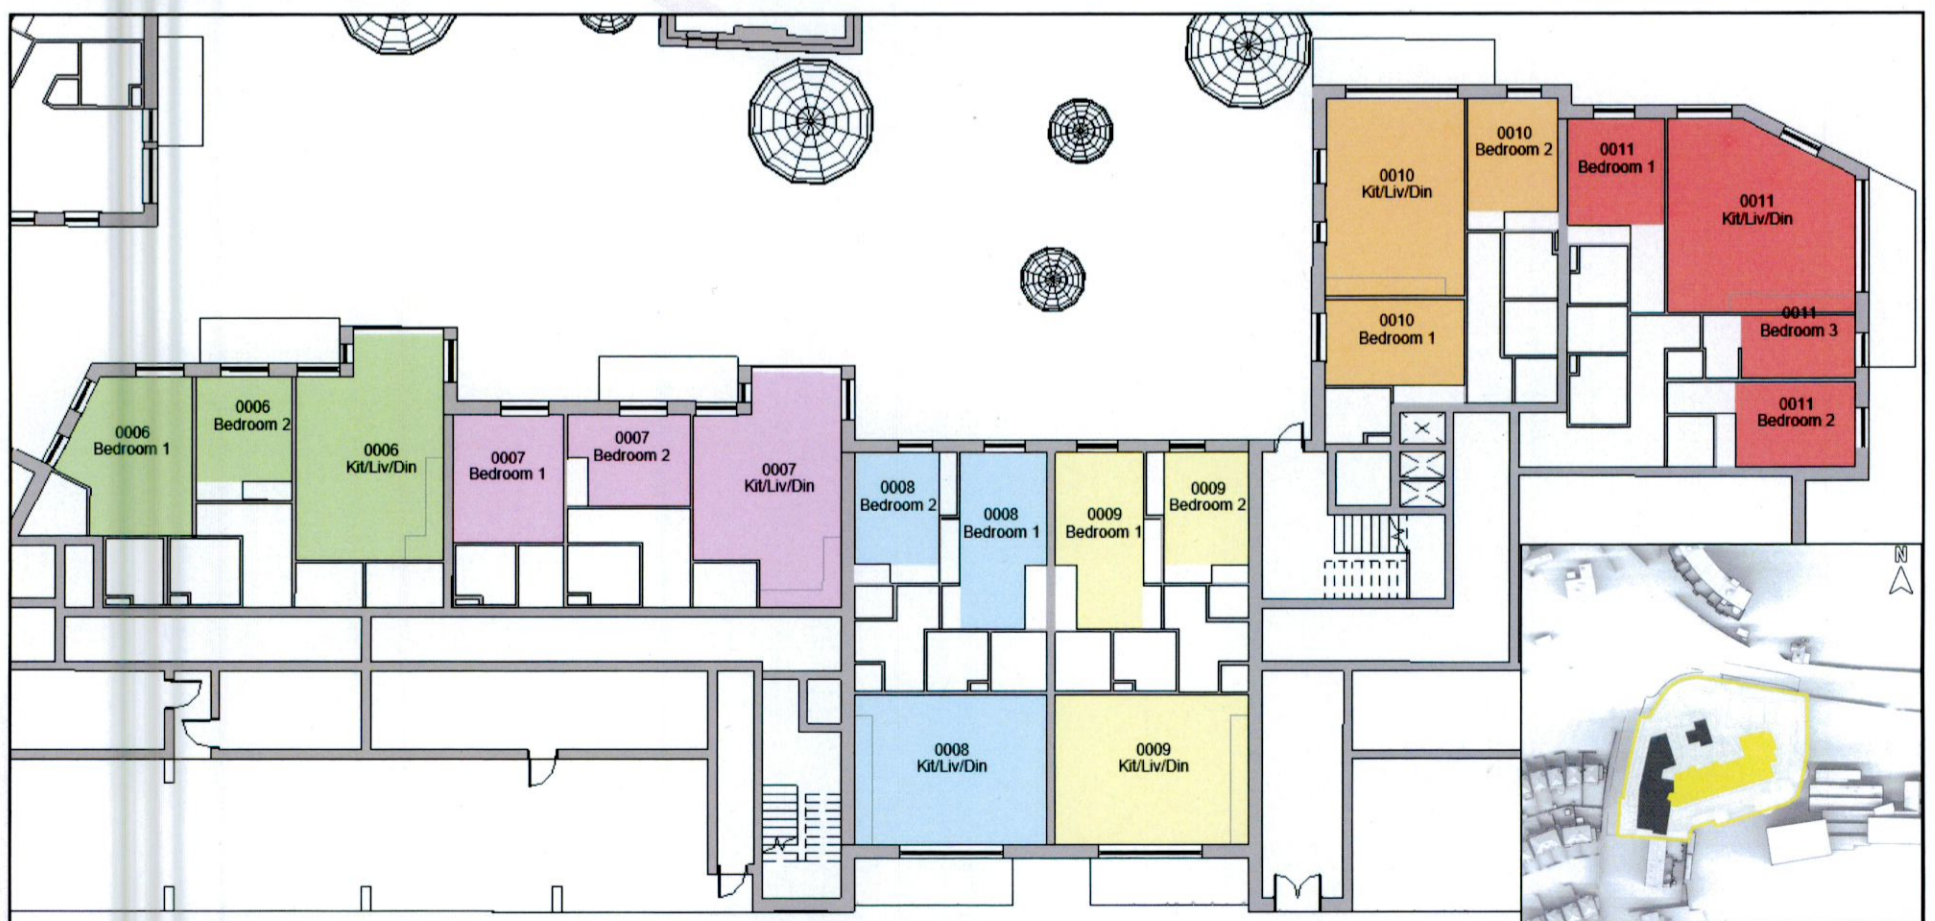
Floor plan of assessed building (L), Keyplan highlighting the assessed building (R).
